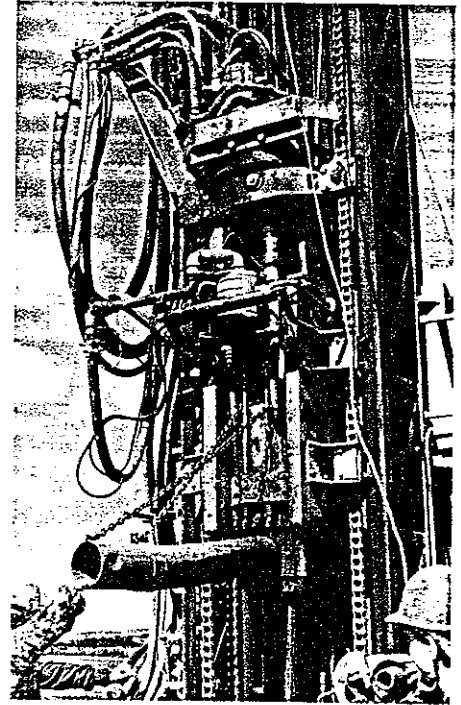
A casing driver is mounted in the mast of this top-head drive rotary rig. As the top-head drive turns the drill string, the casing driver, activated by air pressure, simultaneously drives the casing. (Kramer Well Drilling)
